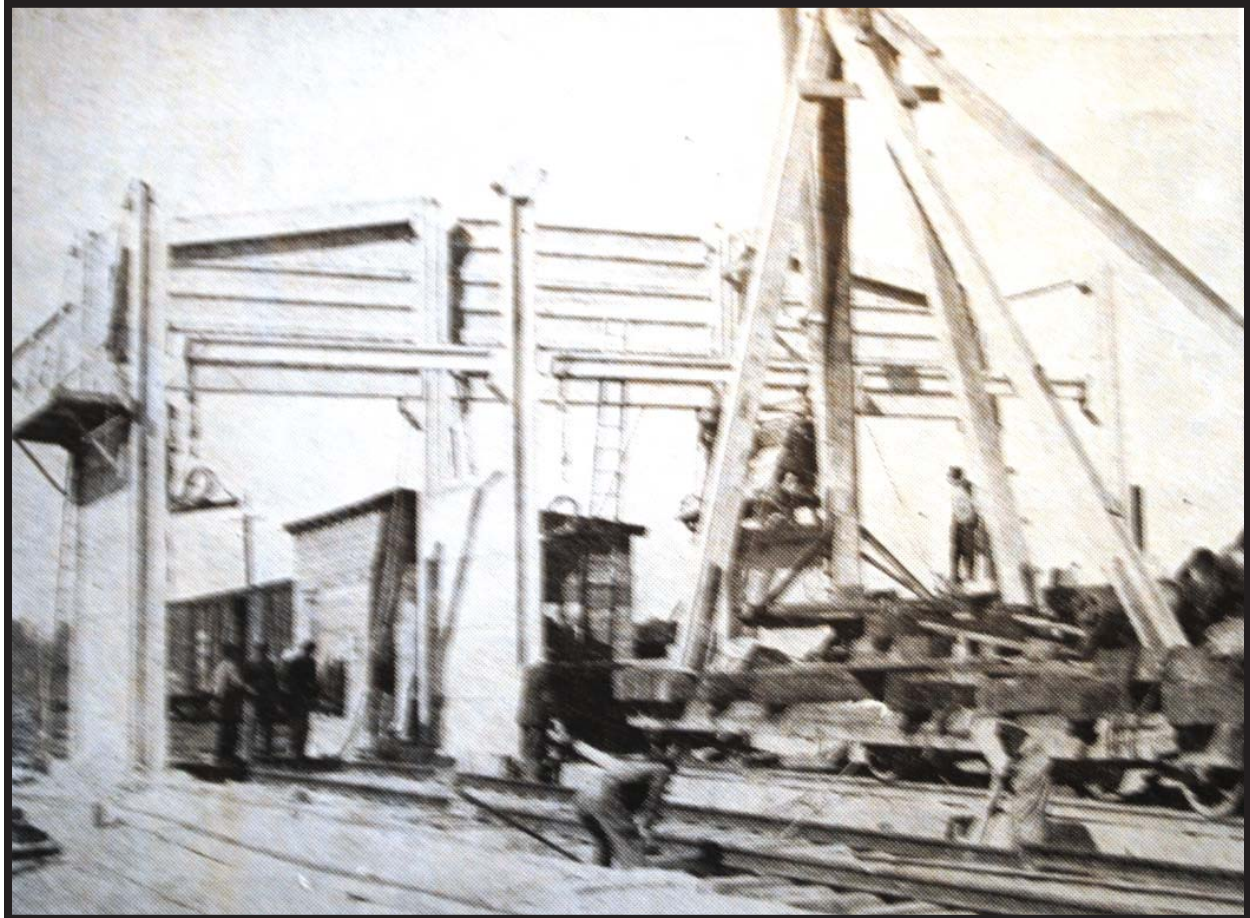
Precast-Concrete Columns, Slabs and Panels Used in the Construction of the Three-Track Coal Thawing House, Pennsylvania Railroad, South Amboy Terminal. 1916. The design made use of innovative pre-cast concrete wall and ceiling units (Source: Linn 1918a).
